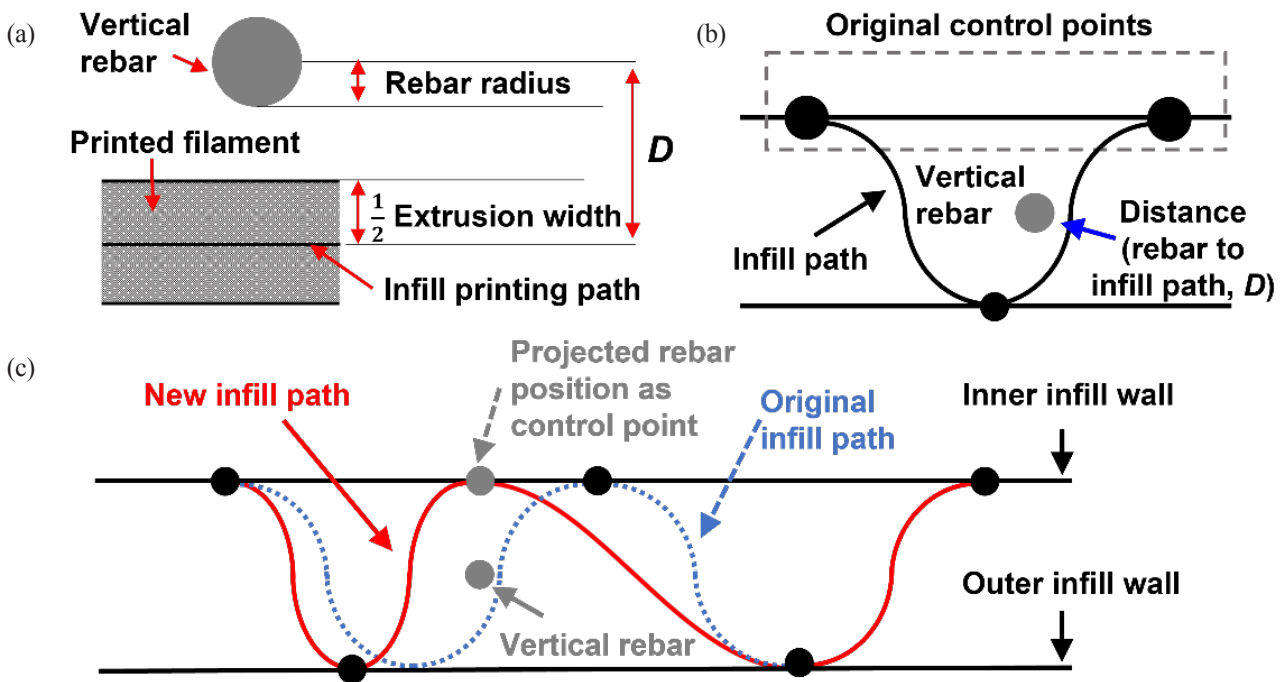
Schematic of infill path optimisation: (a) geometrical relation between rebars and infill printed filament; (b) rebar close to infill path; and (c) the optimisation of a close rebar.
